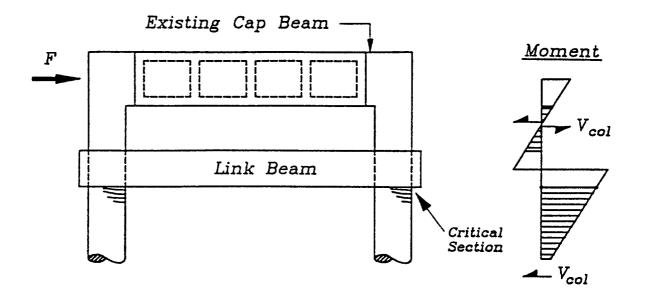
Link beam concept for transverse retrofit (from ref. 18).
